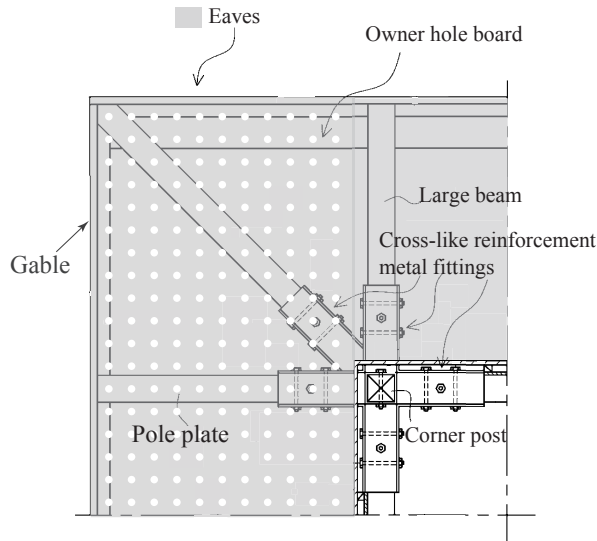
Cross-like reinforcement metal fittings (eaves corner part section bottom plan view)
